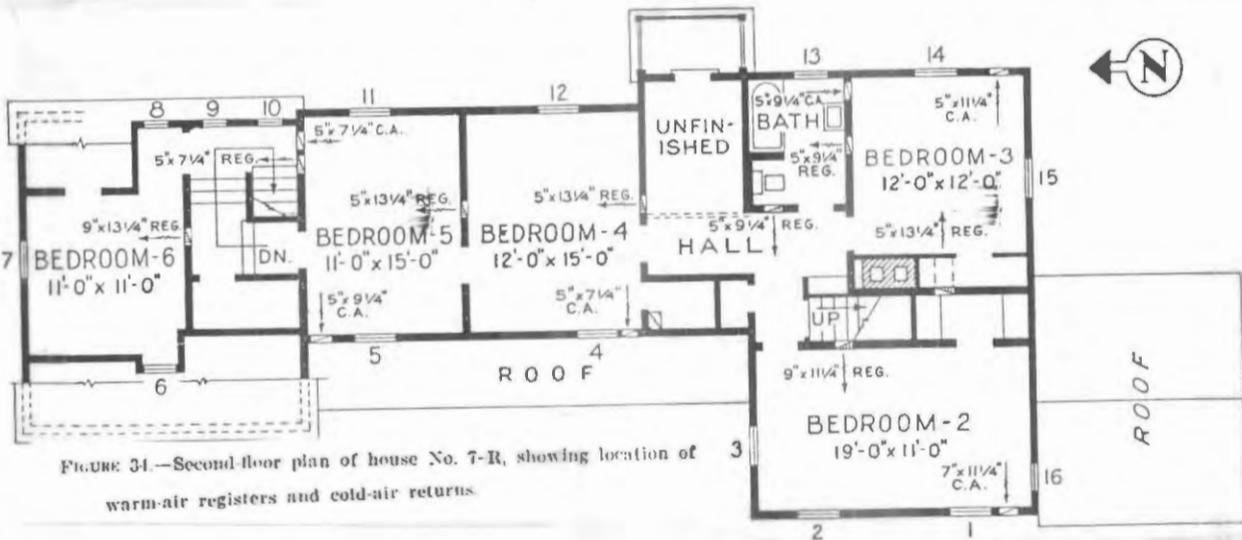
Second-floor plan of house No. 7-R, showing location of warm-air registers and cold-air returns.
